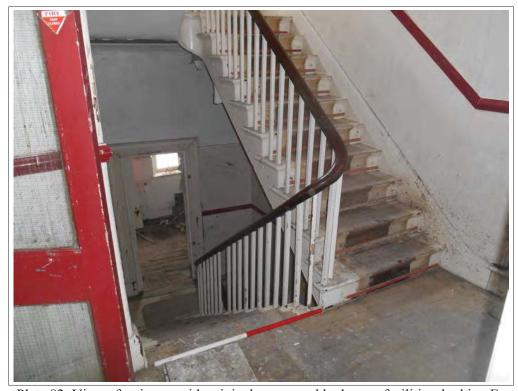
View of staircase with original communal bathroom facilities, looking E.
